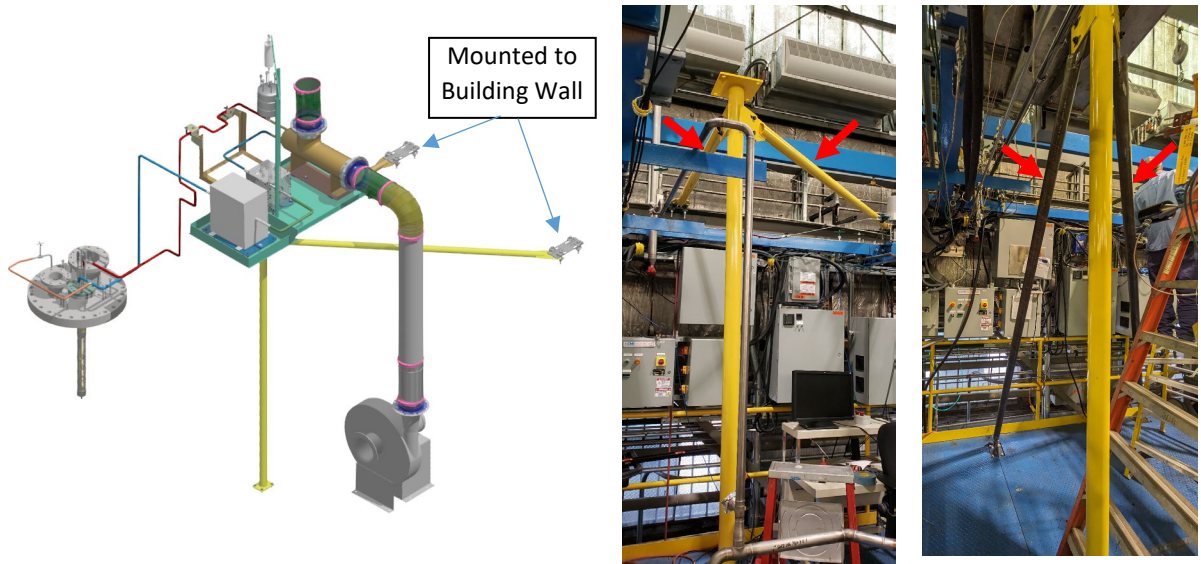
Installation of the THETA secondary support structure. Initially, the support structure was composed of horizontal members which bolted to a building 308 wall I-beam, as shown in left and middle pictures. These members were replaced with angled supports bolted to the METL mezzanine, which is isolated from the building, right picture.
